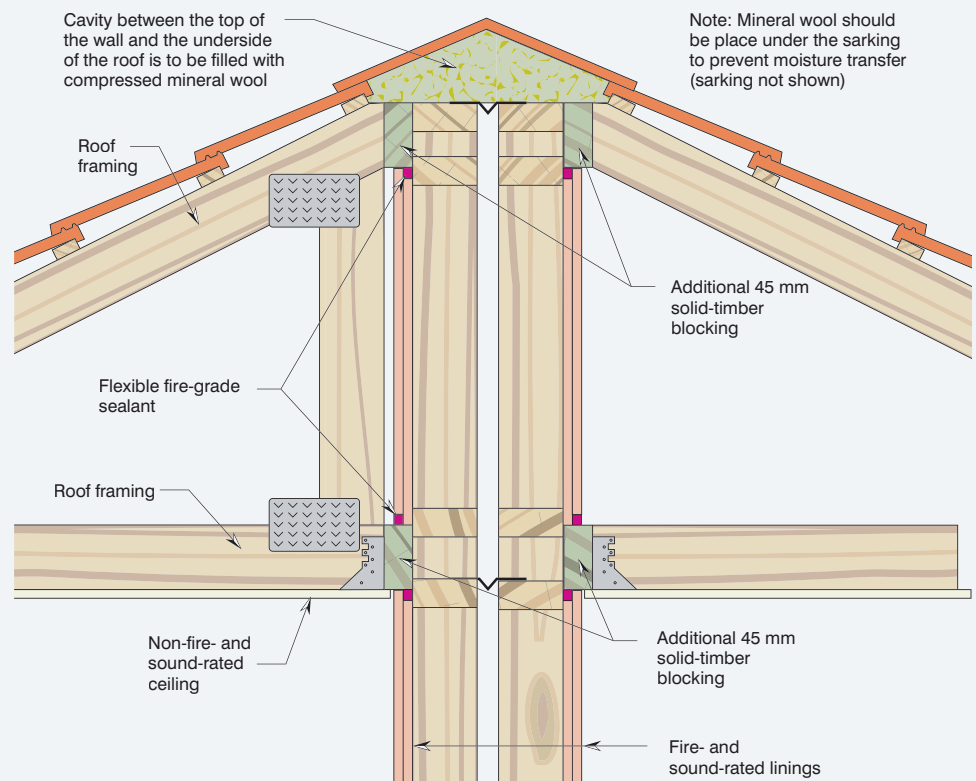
Fire- and sound-rated wall through to underside of roof – FRL 60 minutes – elevation view.
